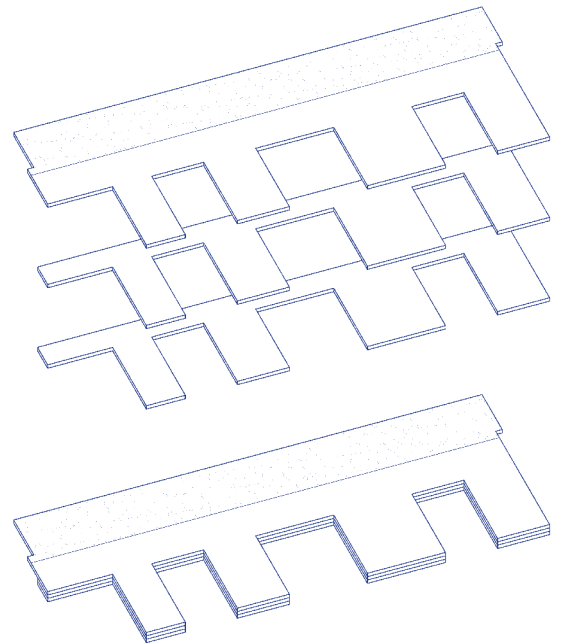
Isometric view of shake-style shingle layers and assembled shake-style shingle.
